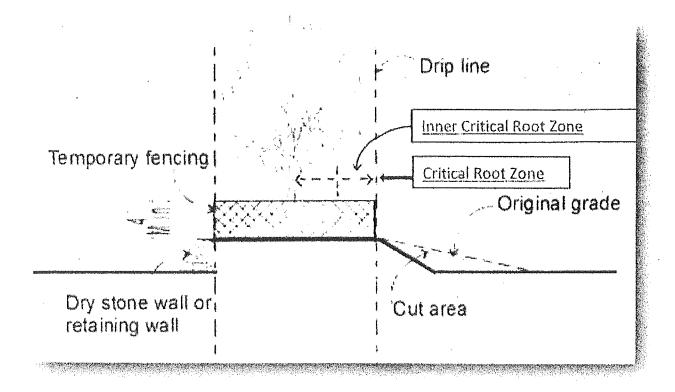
Illustration of standard techniques used to protect trees during construction.
